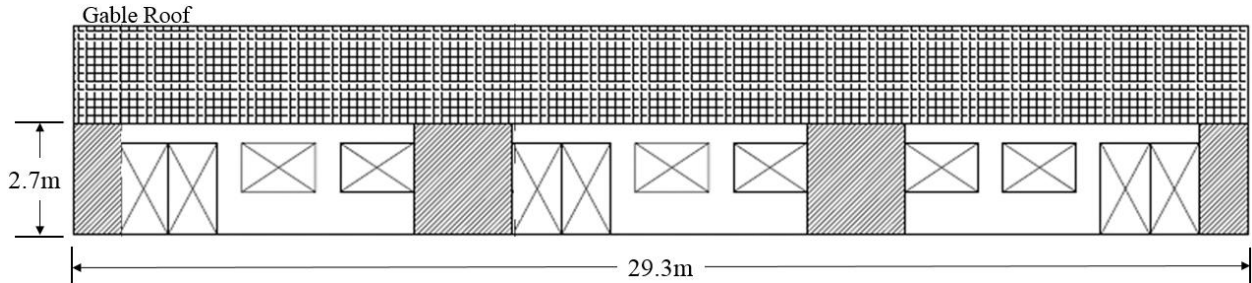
Elevation view of the one-story multifamily wood frame archetype used in this study (modified from ATC 116 (ATC, 2018)).
